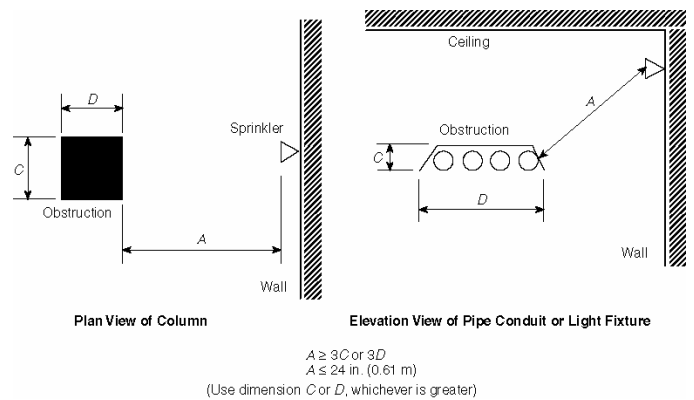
NFPA 13 - Sidewall Sprinkler Obstructions
